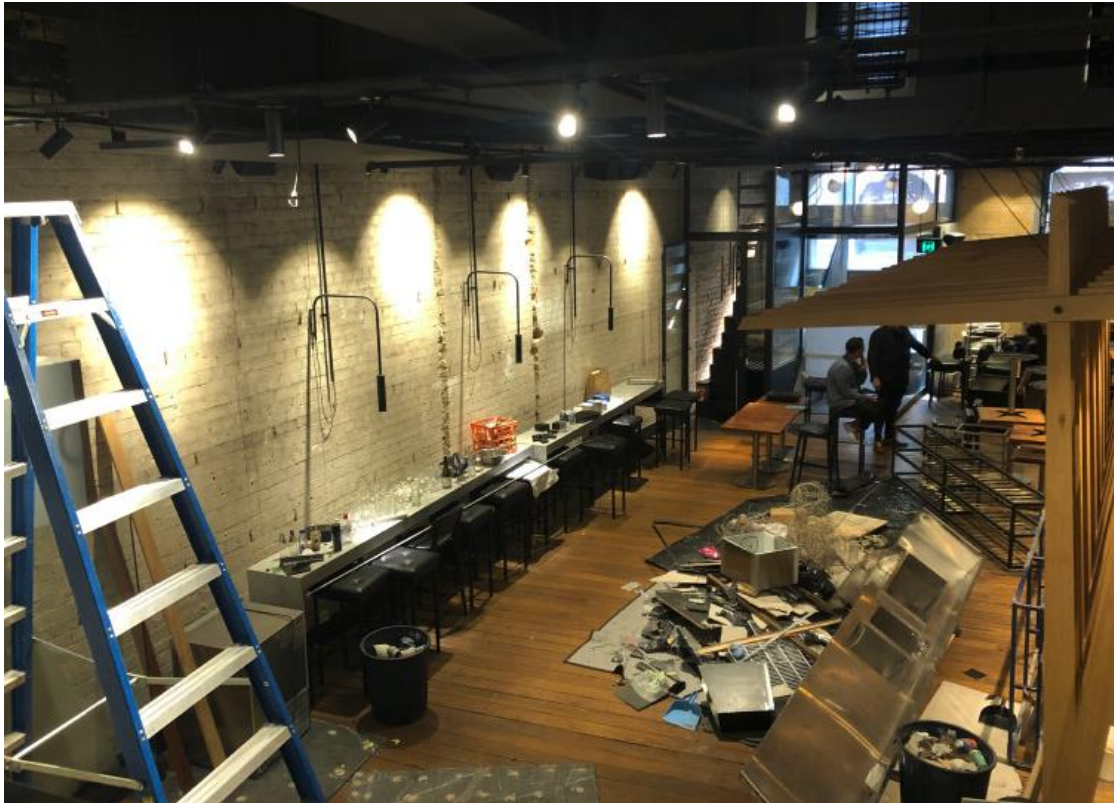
Internal view of subject tenancy, looking towards Bridge Street entrance
